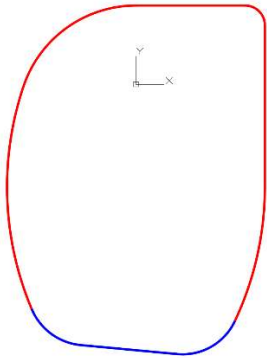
Tunnel type 6 - Cross section (clearance profile)
